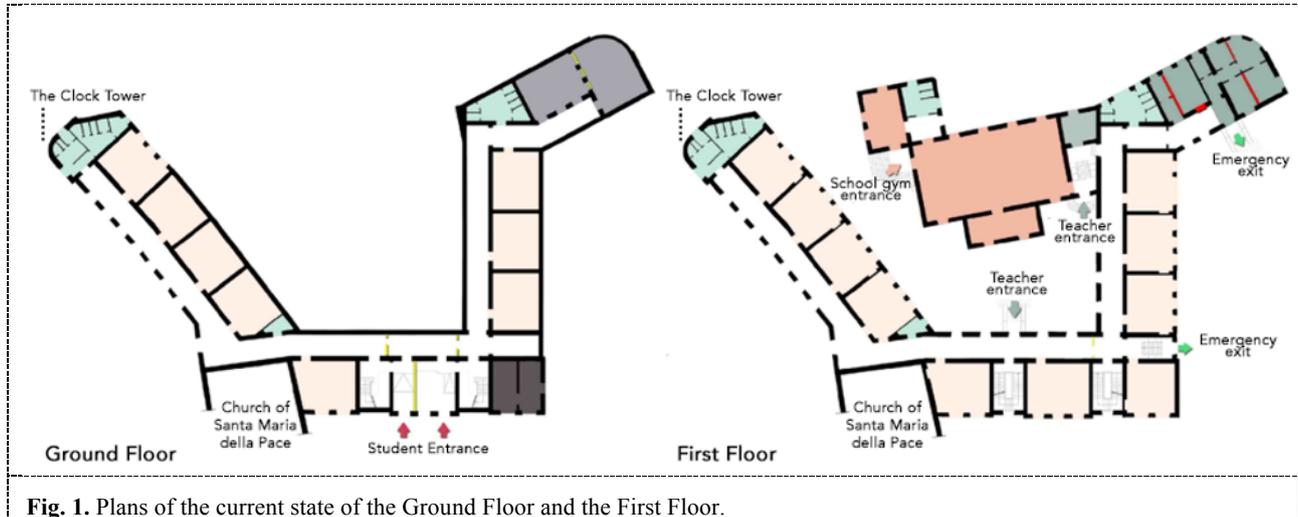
Plans of the current state of the Ground Floor and the First Floor.
